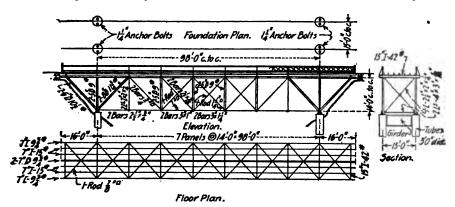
DECK PRATT PIN-CONNECTED HIGHWAY BRIDGE.
